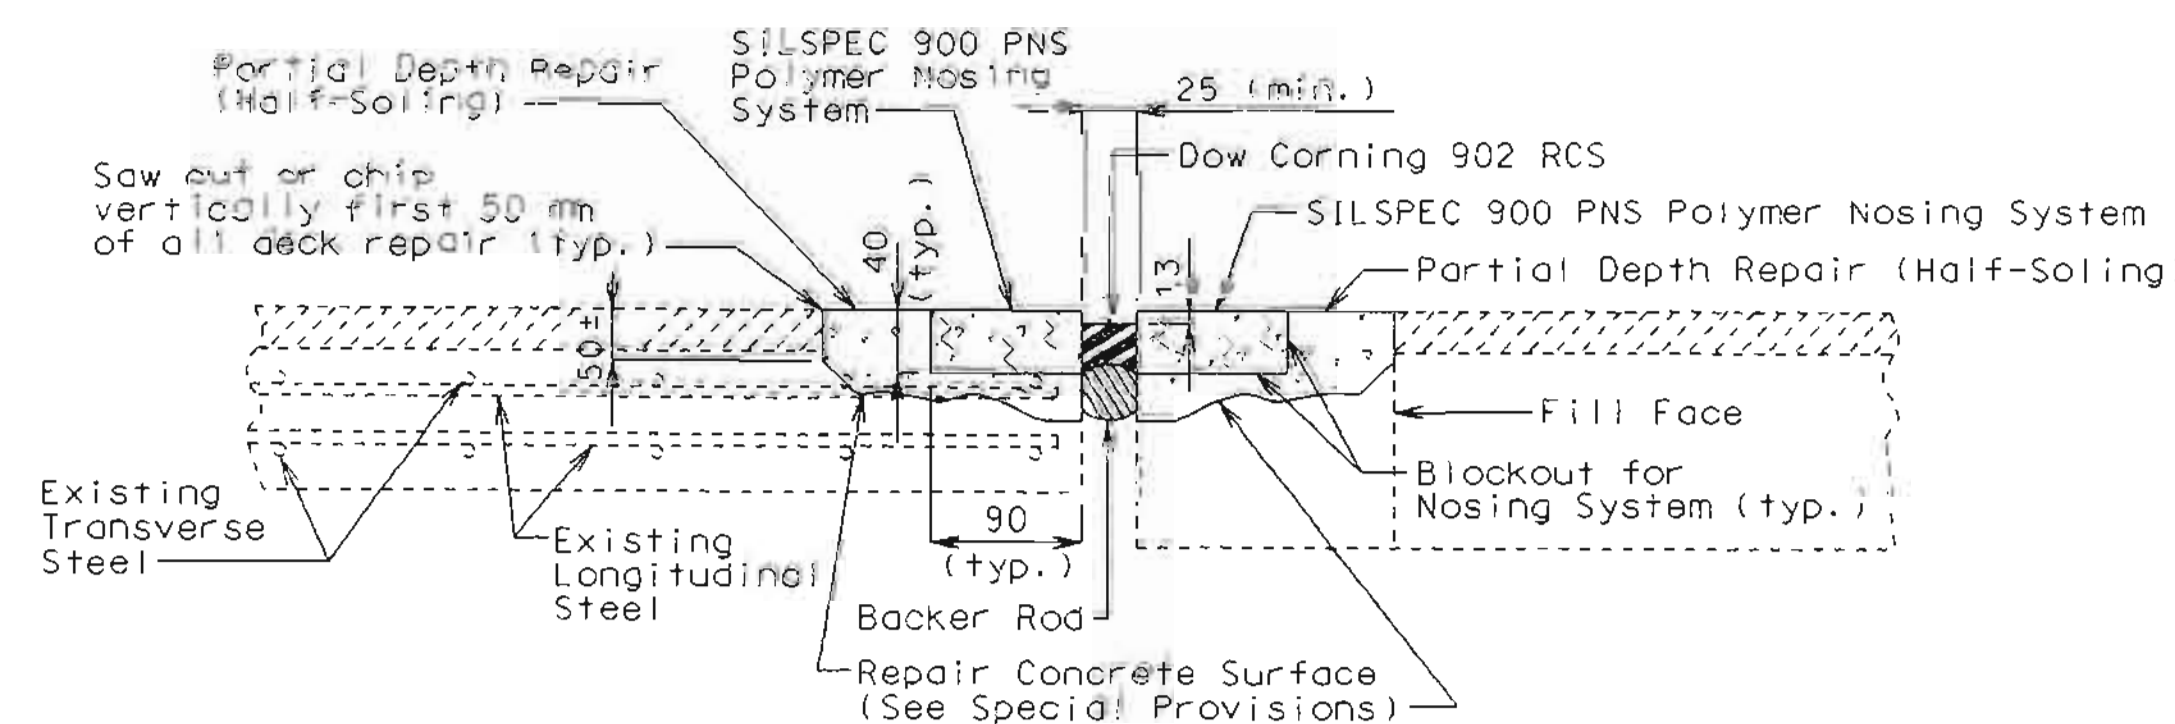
DETAIL SHOWING REMOVAL OF EXISTING EXPANSION DEVICE
